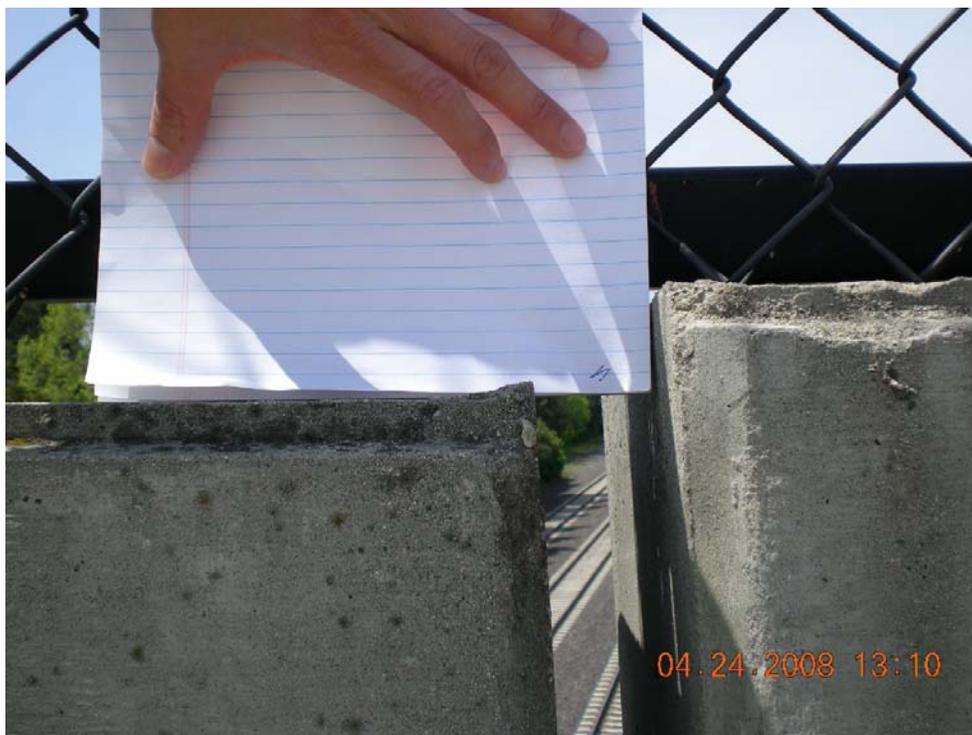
View of 1½" differential at Barrier at North Hinge (west side)
